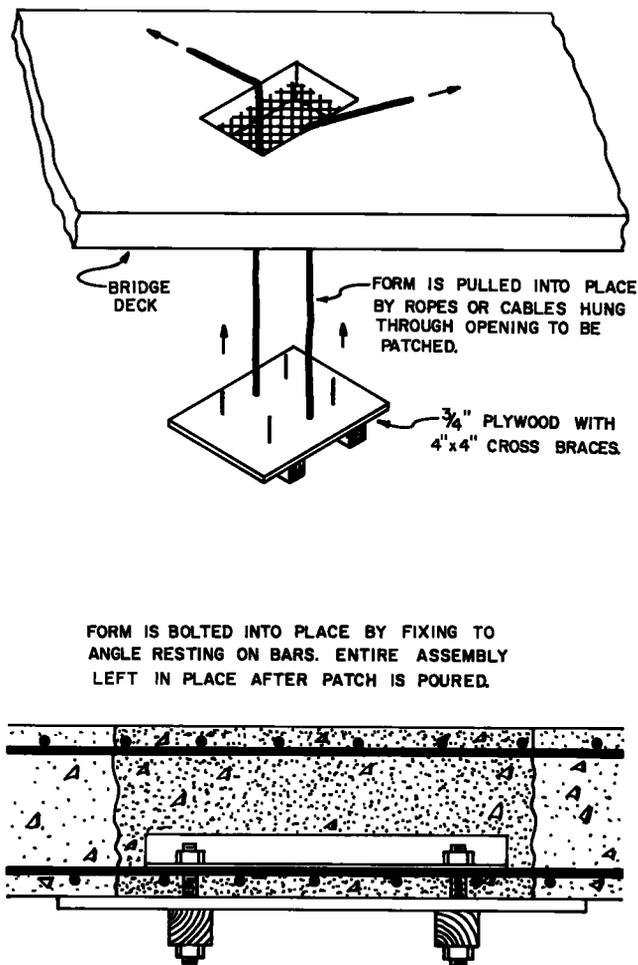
Stay-in-place deck forming procedure used where bridge underface is difficult of access, D.C. Department of Highways and Traffic.
